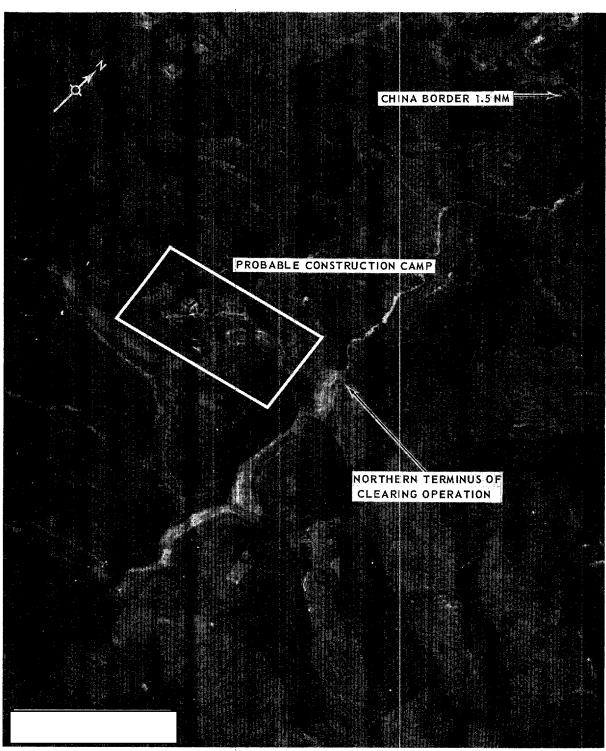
ROAD CONSTRUCTION, NORTH VIETNAM
